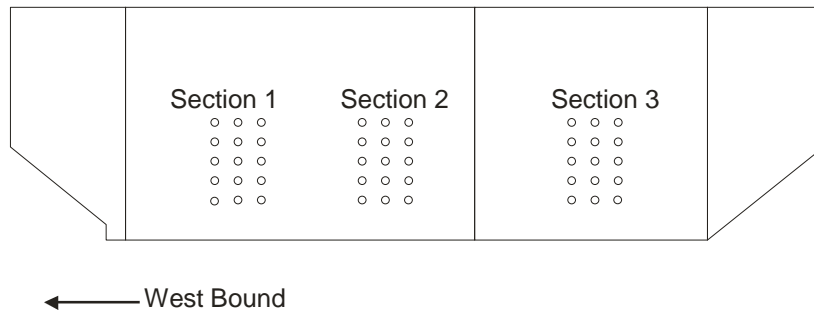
Treatment and monitoring plans for the South Parkway bridge over I-395.
